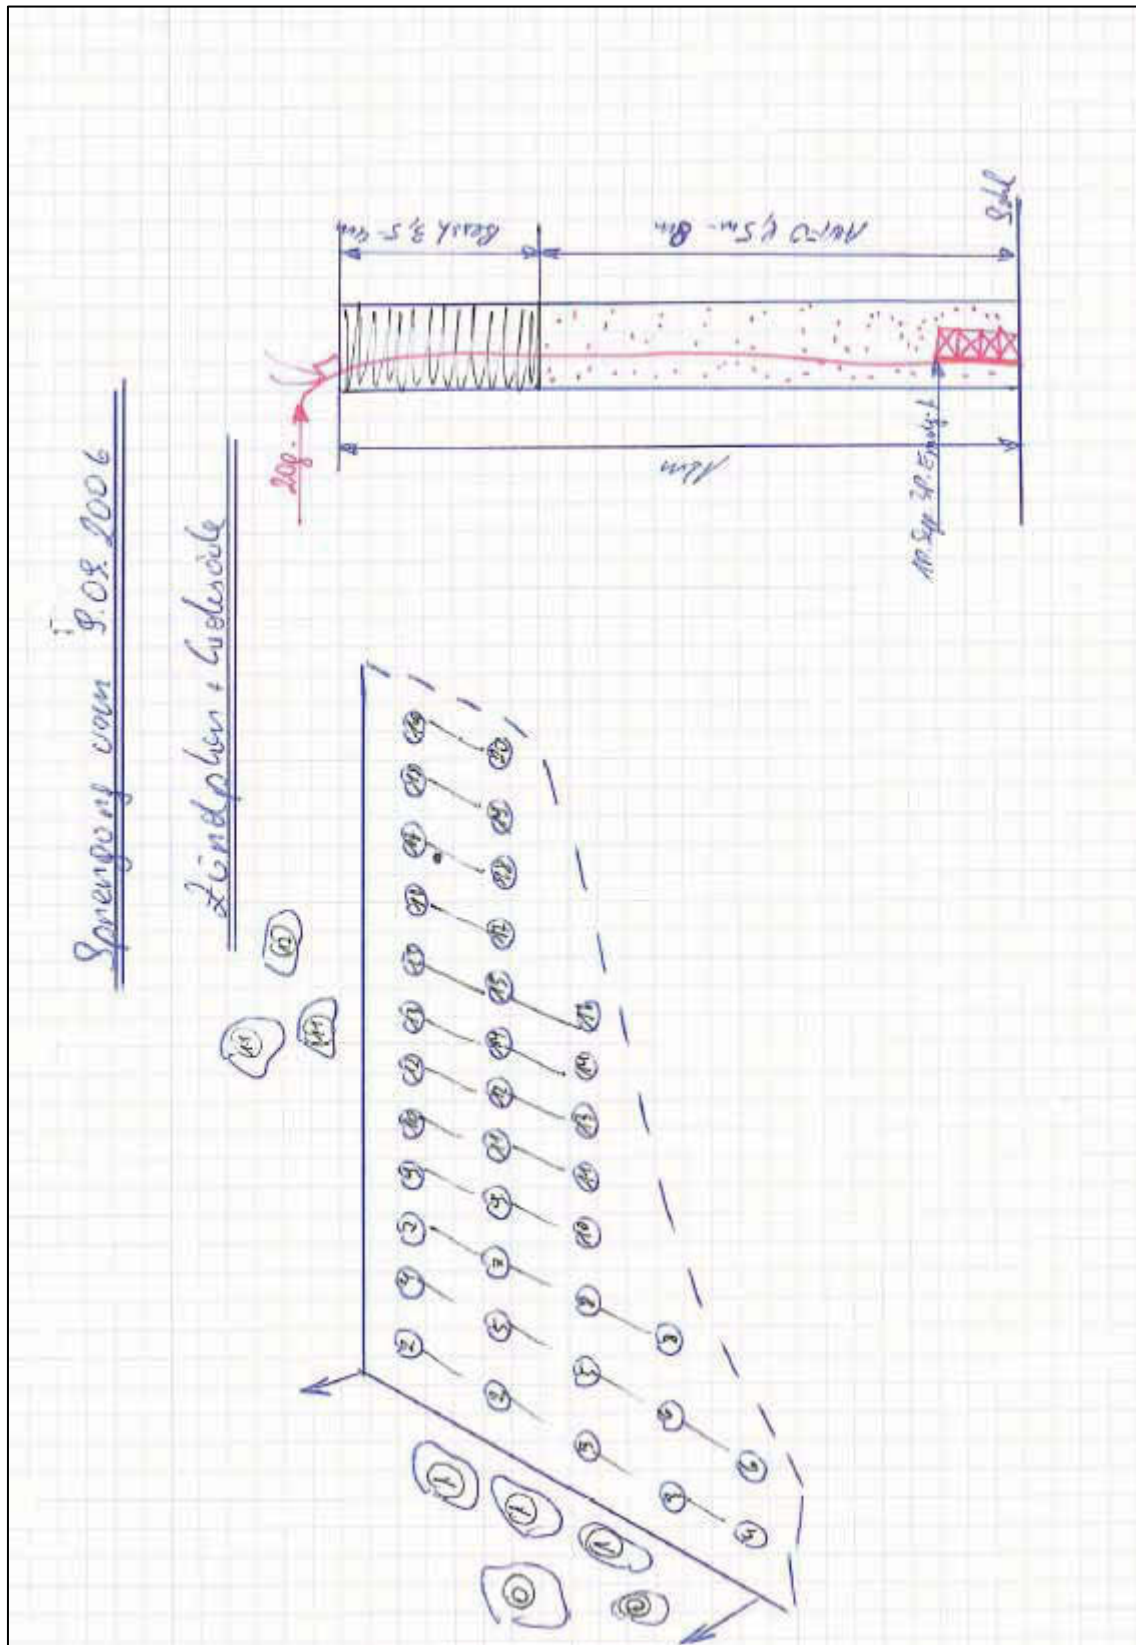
Shot-firer's plan of the 5th blast, Source [27]
